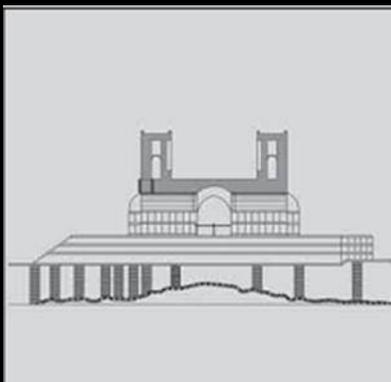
Section of Khaju Bridge and foundations (photograph by Shah Karami, 2006).
